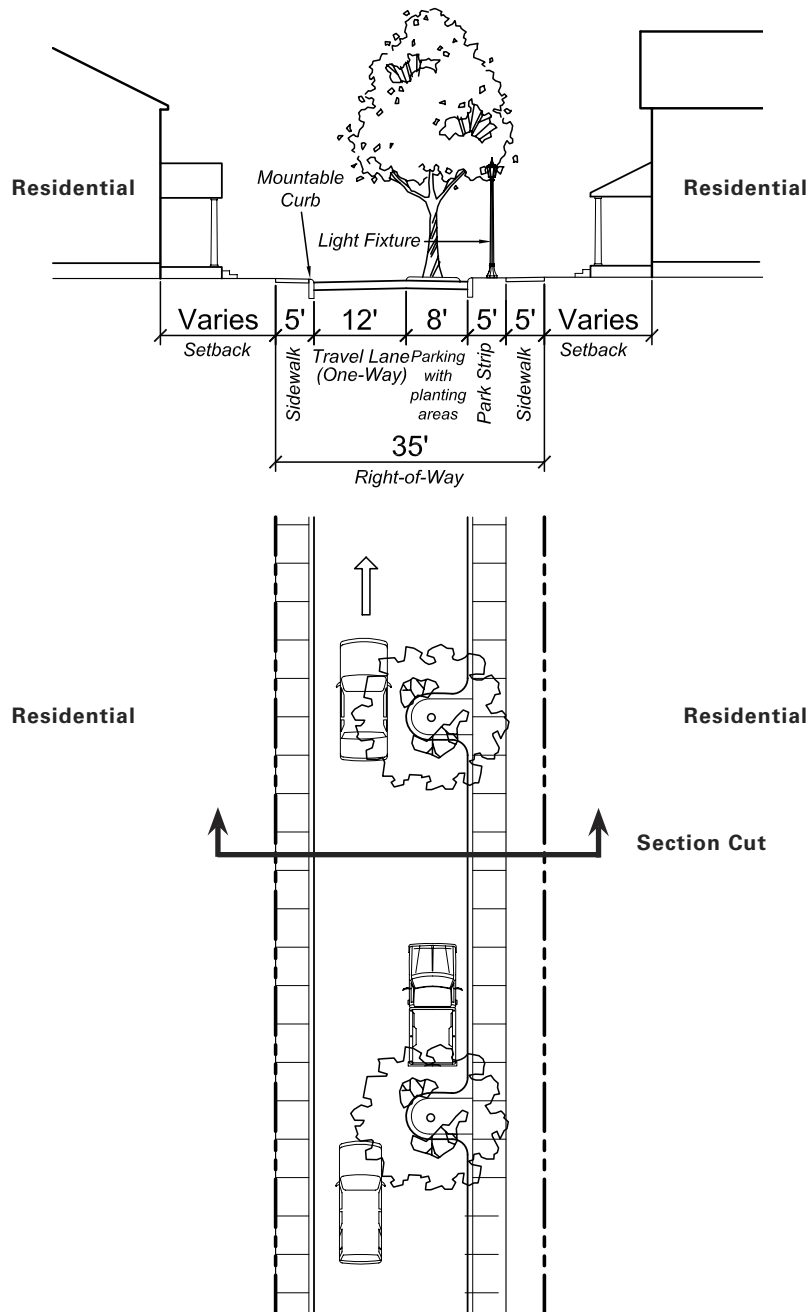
Proposed Section and Plan: Neighborhood Street C
